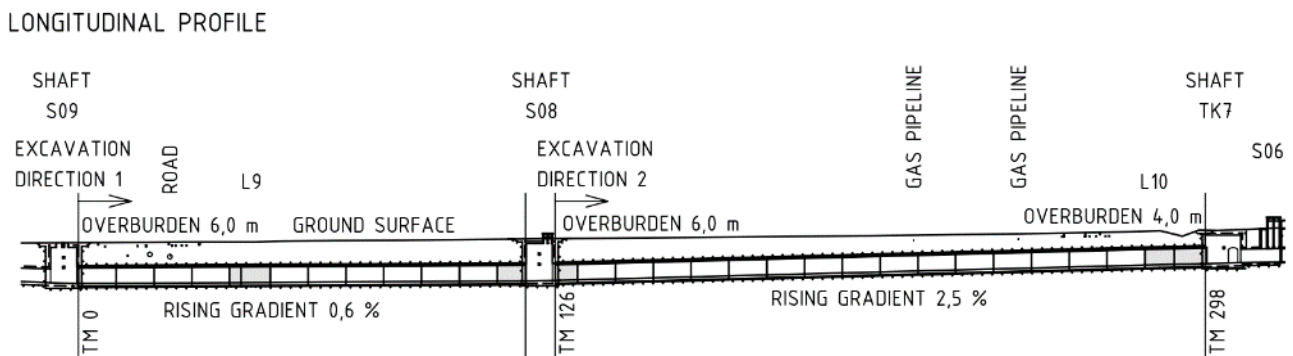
Longitudinal profile of the mined section of the utility tunnel
